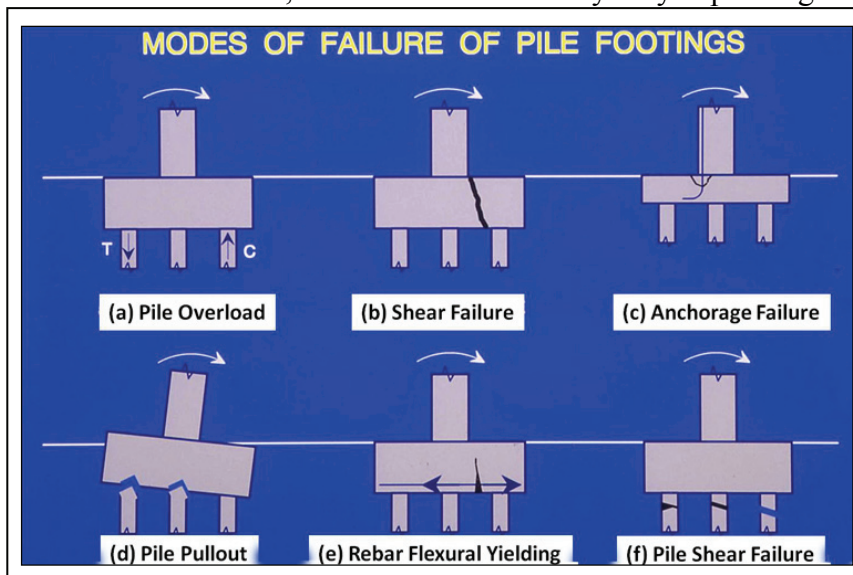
Modes of Failure of Pile Footings, (Aboutaha, 1993)
